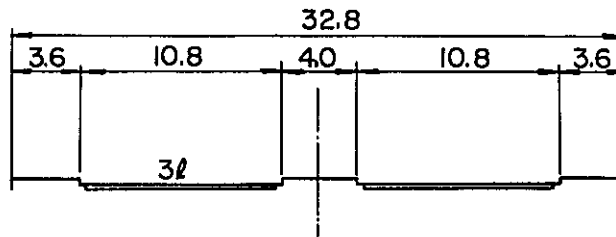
(2) EXISTING GOVERNOR FORBES SECTION (C-2)
